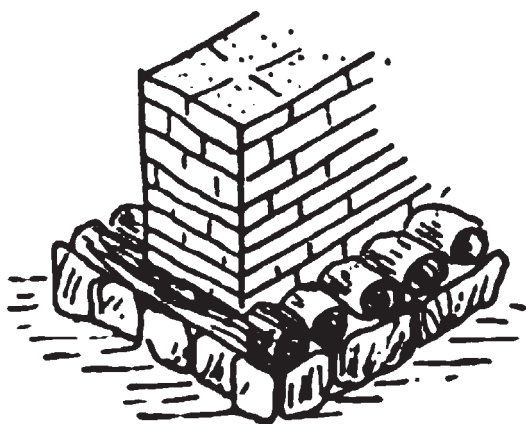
Round wood foundation base over limestone blocks [2, 4, 5]
